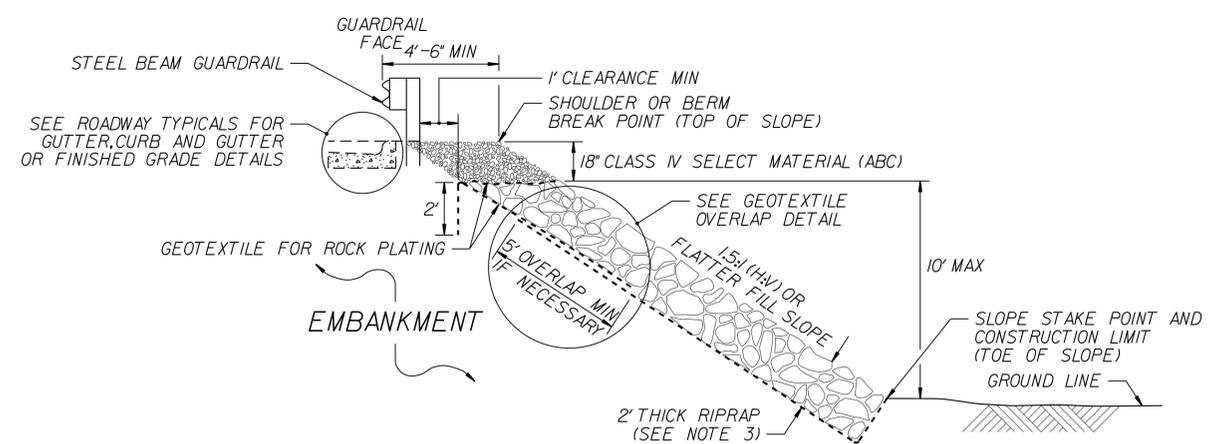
DETAIL SHOWING GUARDRAIL WITH SHOULDER BERM GUTTER
